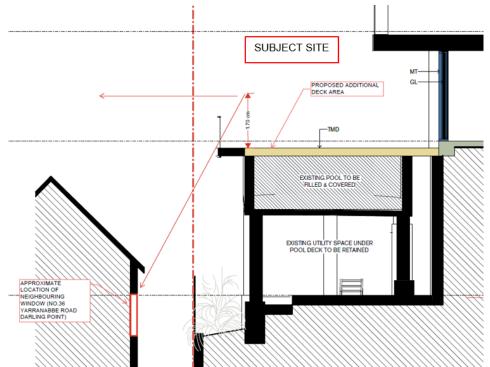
Cross section through the Lower Ground Floor elevated deck.
